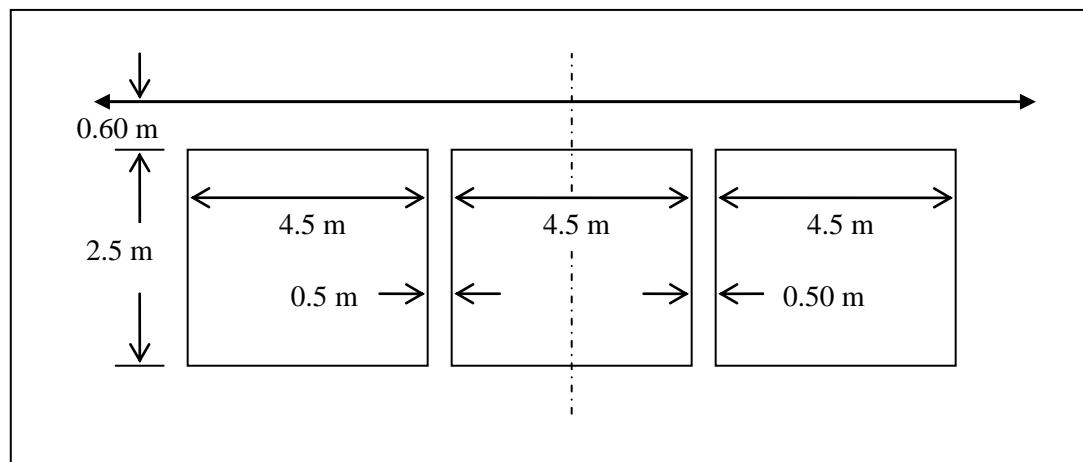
Dimensions of bridge at Section 3 of Bostancı Creek
